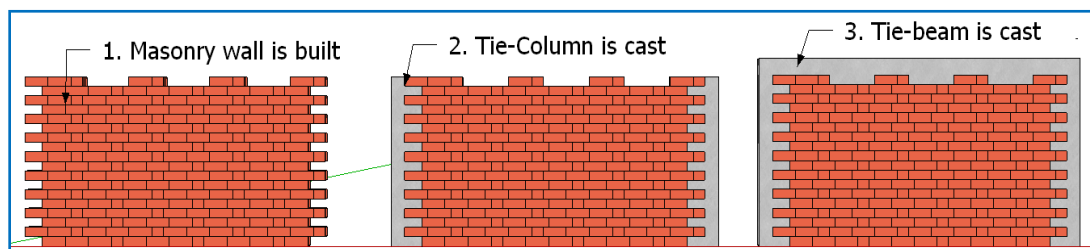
Confined masonry construction sequence (Brzev, 2008)
